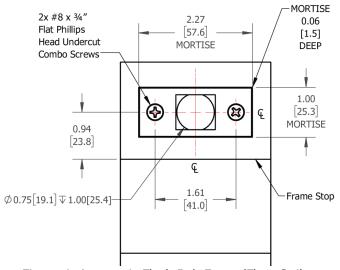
Automatic Flush Bolt Frame/Floor Strike
